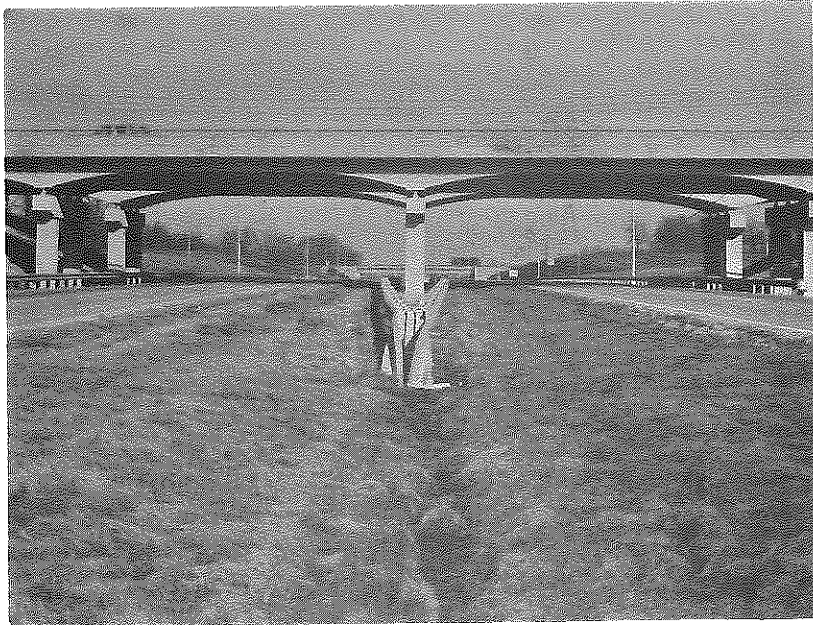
Median Bridge Piers "Protected" with Guardrail.
